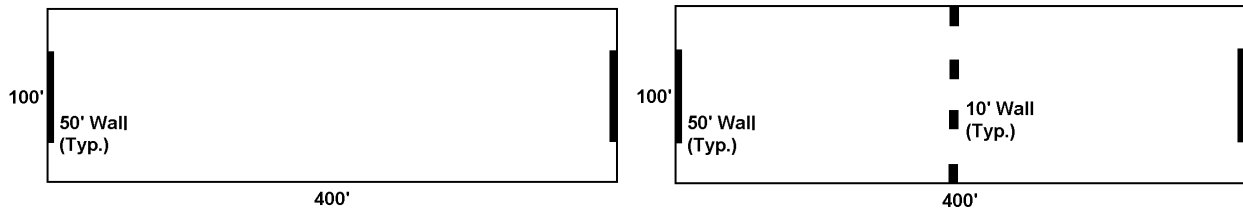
Plan view of two tilt-up structures with flexible wood diaphragms. The structure on the left is considered redundant and reliable. Nonsensically, the structure on the right, which has a larger number of walls, greater wall length, and an interior line of resistance, is considered significantly nonredundant and unreliable and is penalized by an increase in its base shear coefficient of 20%. According to ASCE 7-05, both structures are sufficiently redundant, despite the fact that the structure on the left has a very long, very slender diaphragm and does not necessarily appear to be a “good” design.
